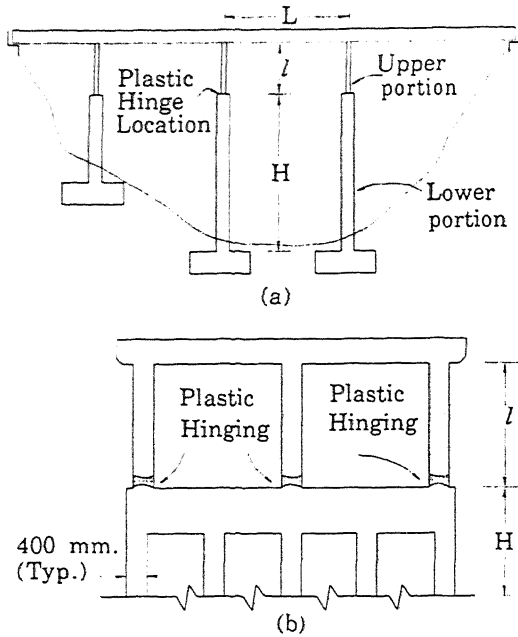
Tall bridge pier composed of two segments. (a) elevation (b) plan
